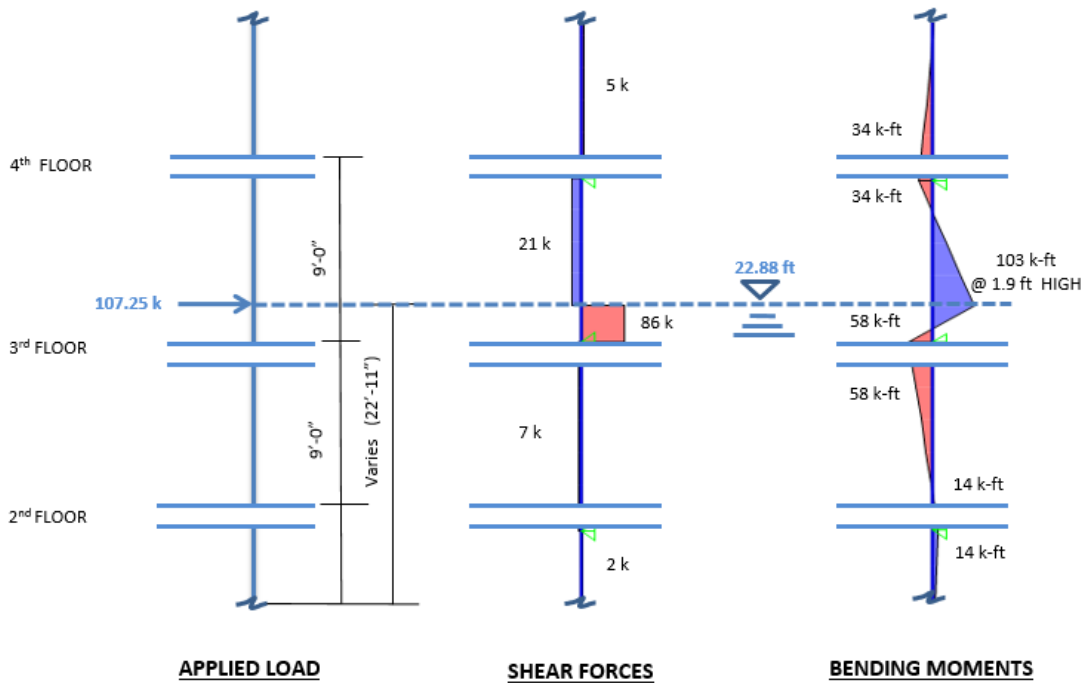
Impact load applied at 1.9 ft away instead of " $d + h_c$ " away from the end of column on the 3rd floor
